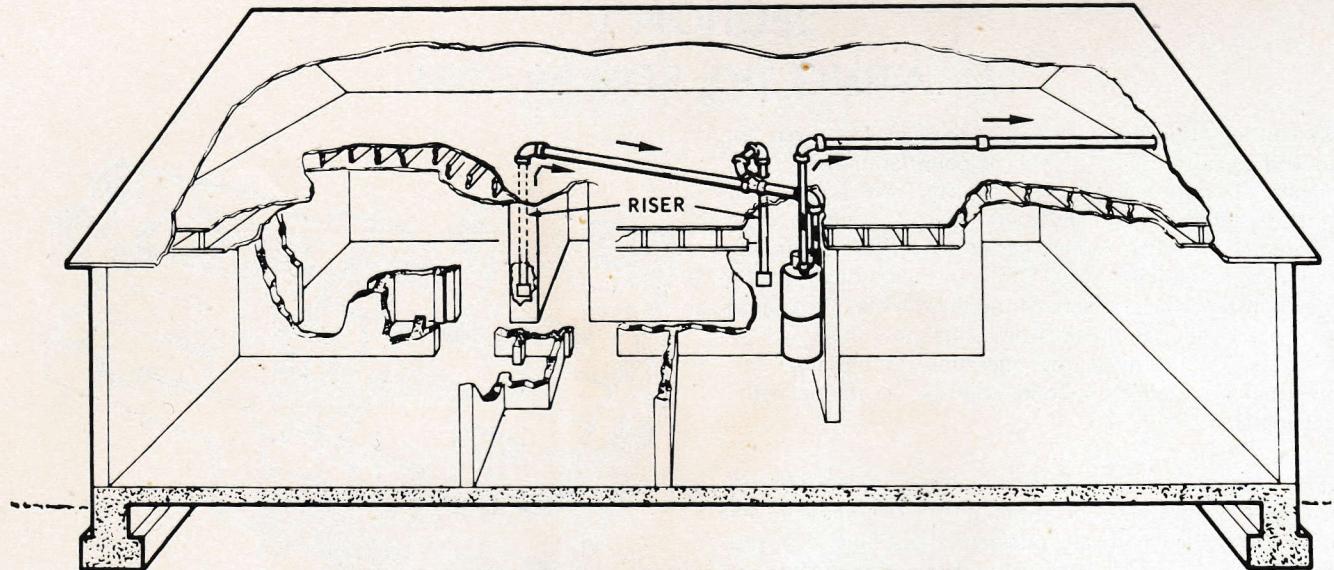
TYPICAL INSTALLATION IN RANCH
